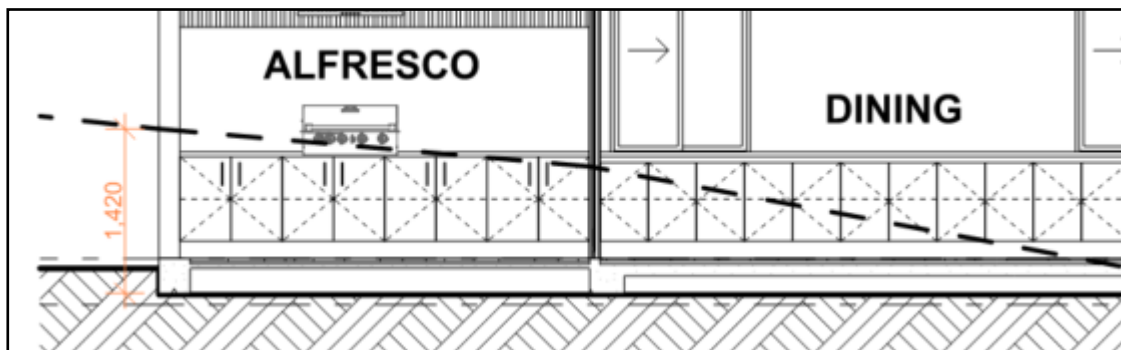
Maximum cut required to facilitate the floor level of the Alfresco (Source: Prime Design)
